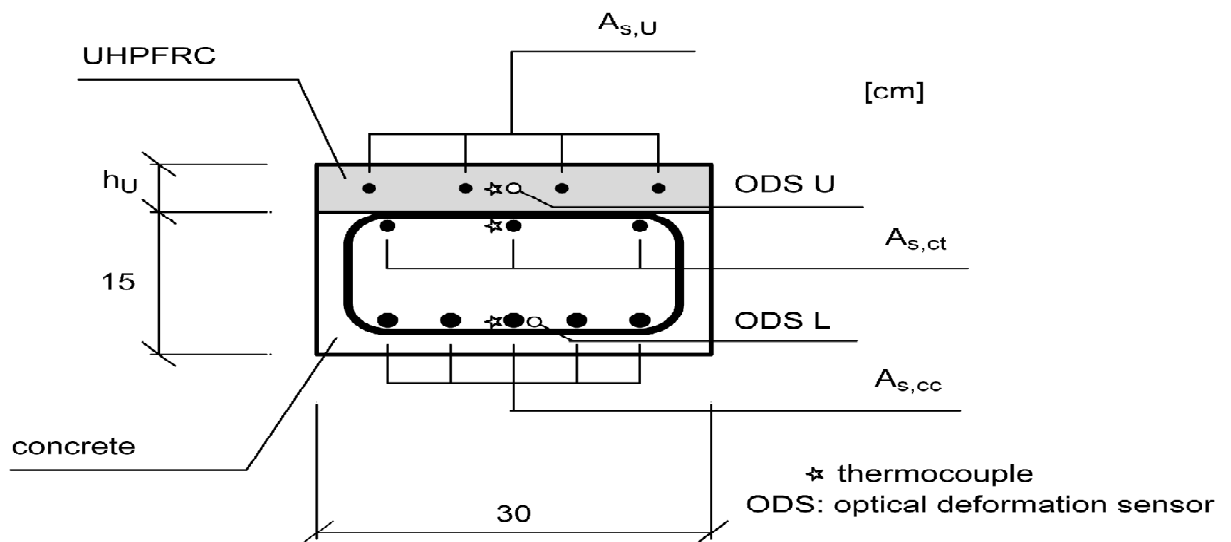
Cross-section of the composite “UHPFRC-concrete” beams^[13]
